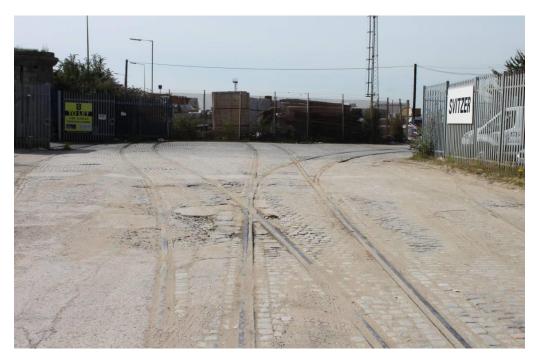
Dock railway lines (Site 30) and granite setts running south from Bramley-Moore Dock
